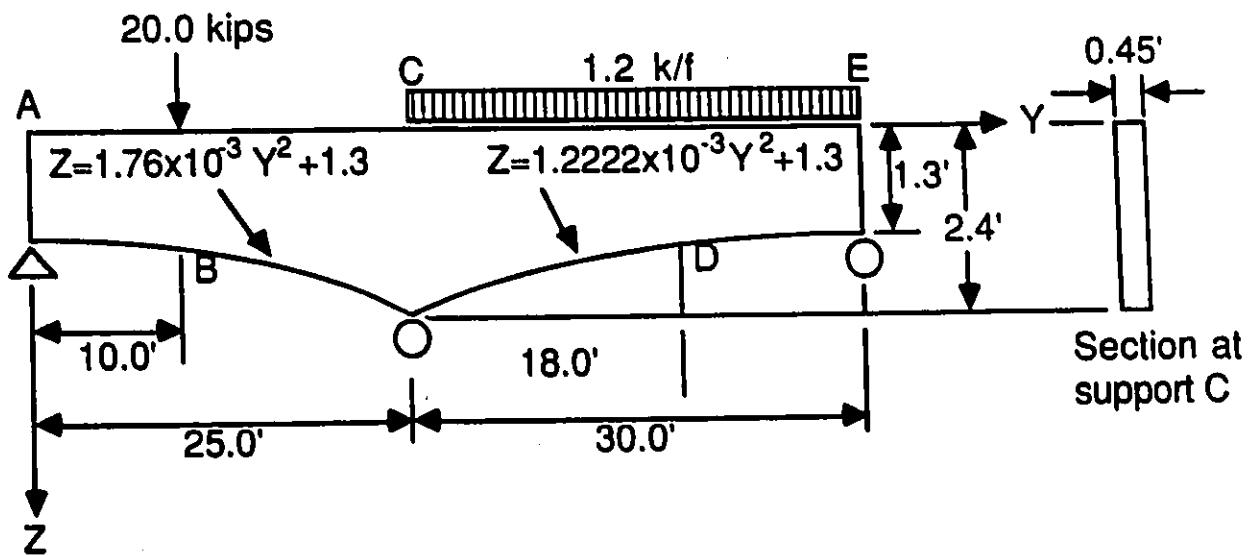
LOADS AND LAYOUT OF EXAMPLE 5.3.2
